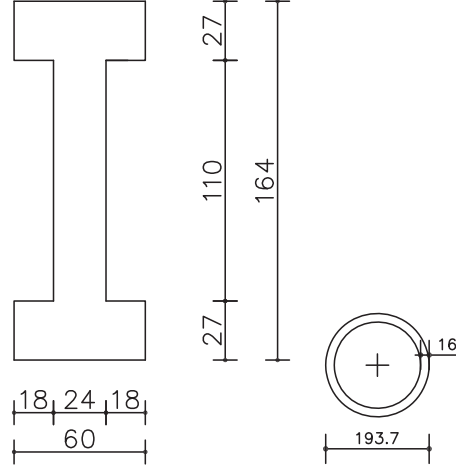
Double-T-shaped section of the concrete beam (on the left). Dimensions are expressed in [cm]. Circular hollow section (CHS) of the steel arch beam (on the right). Dimensions are expressed in [mm].
